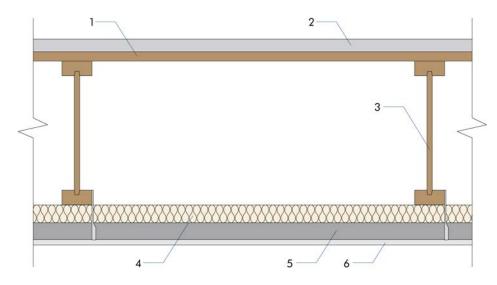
ONE-HOUR FIRE-RESISTANCE-RATED FLOOR-CEILING ASSEMBLY (Ceiling—one layer of ½-inch or ⁵/₈-inch gypsum wallboard, attached to furring channels spaced 24 inches on center)
